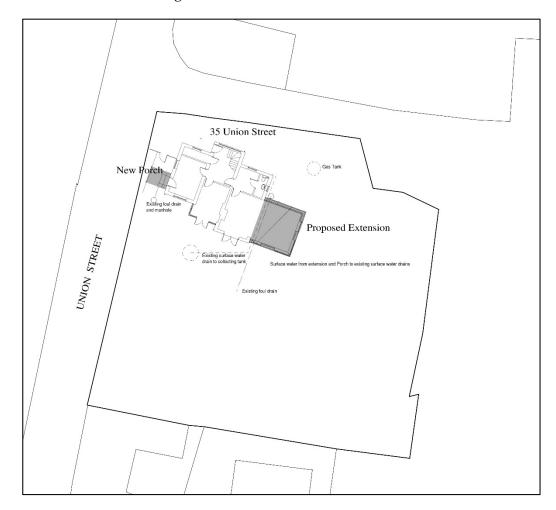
Architects plan (north is top) showing the extension and porch (shaded grey)
